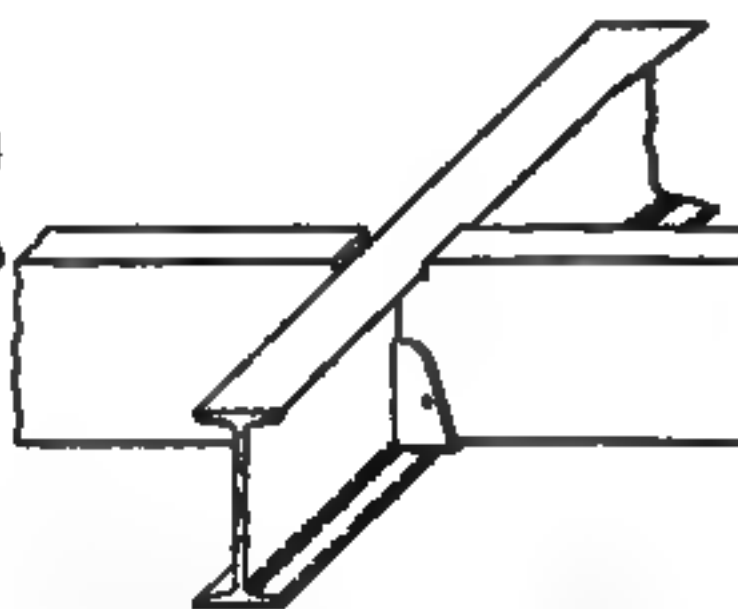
Wooden Beam Framed to I B with Duplex Hanger
